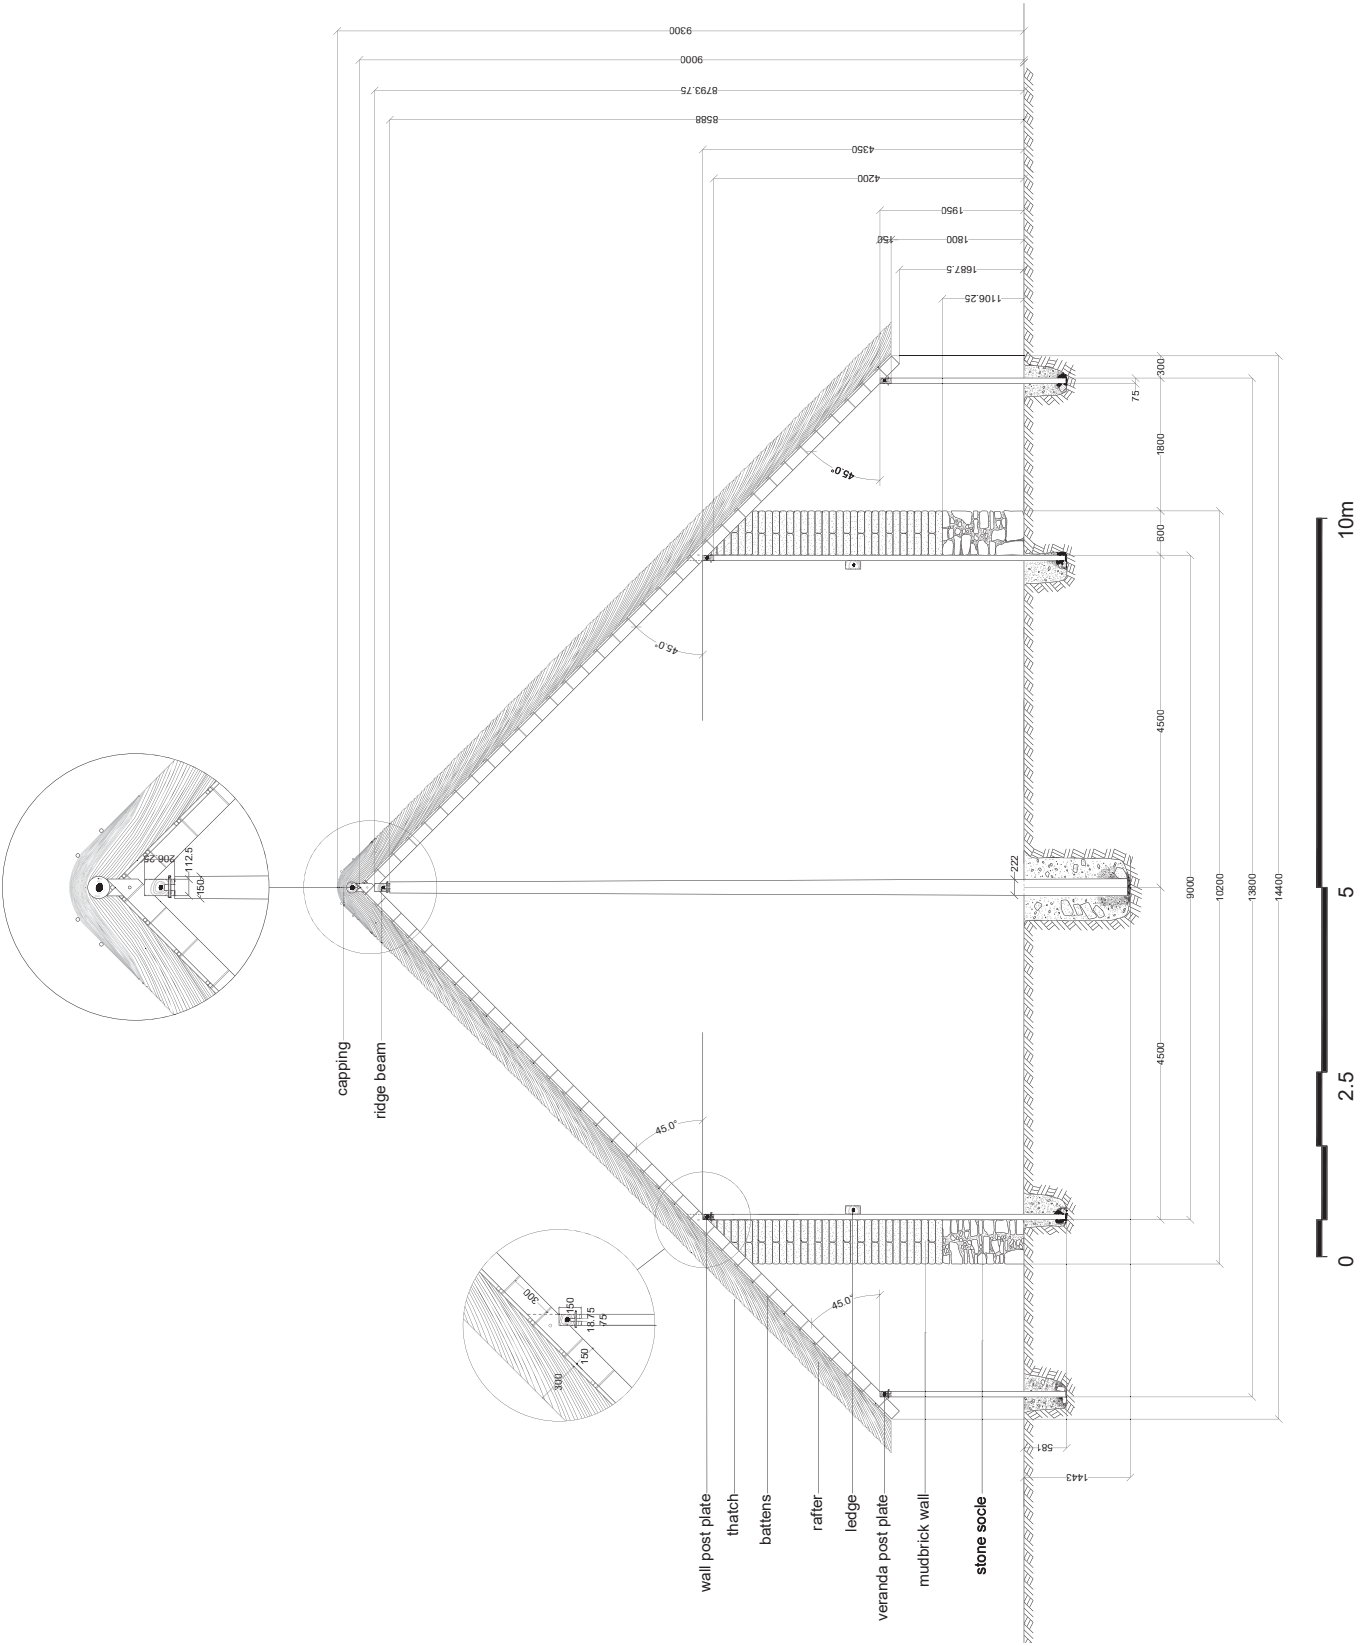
Idealised reconstruction of a cross-section of the building in the area east of B-B', with 'prop-and-ridgepole' or 'column-and-ridgepole' roof construction. The details of the walls and post pits are hypothetical.
